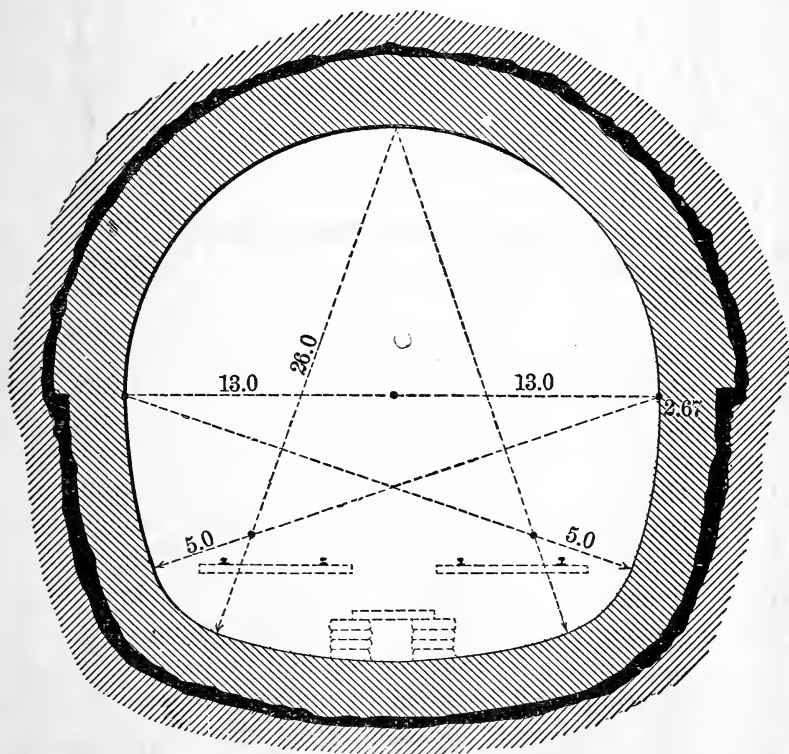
HOOSAC TUNNEL. SECTION THROUGH SOFT GROUND.
